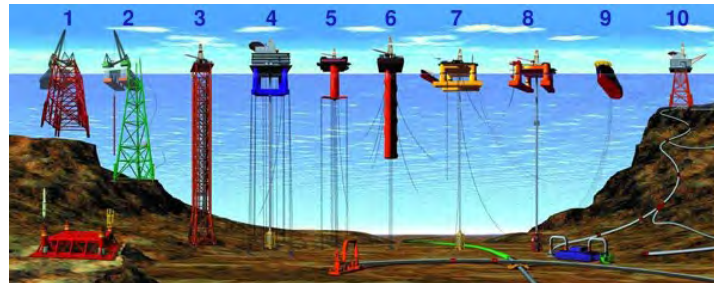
1, 2) conventional fixed platforms; 3) compliant tower; 4, 5) vertically moored tension leg and mini-tension leg platform; 6) spar; 7,8) semi-submersibles; 9) floating production, storage, and offloading facility; 10) sub-sea completion and tie-back to host facility.
